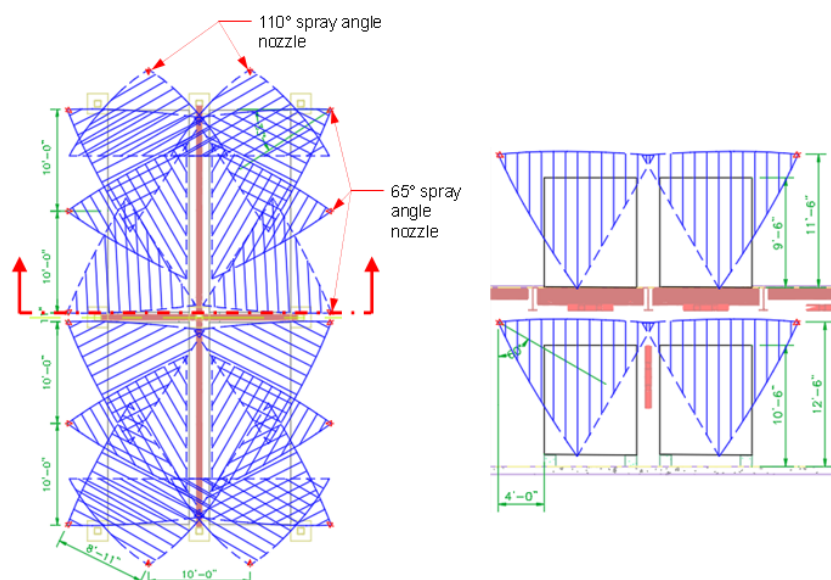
Plan (left) and section (right) view of water spray nozzle arrangement
